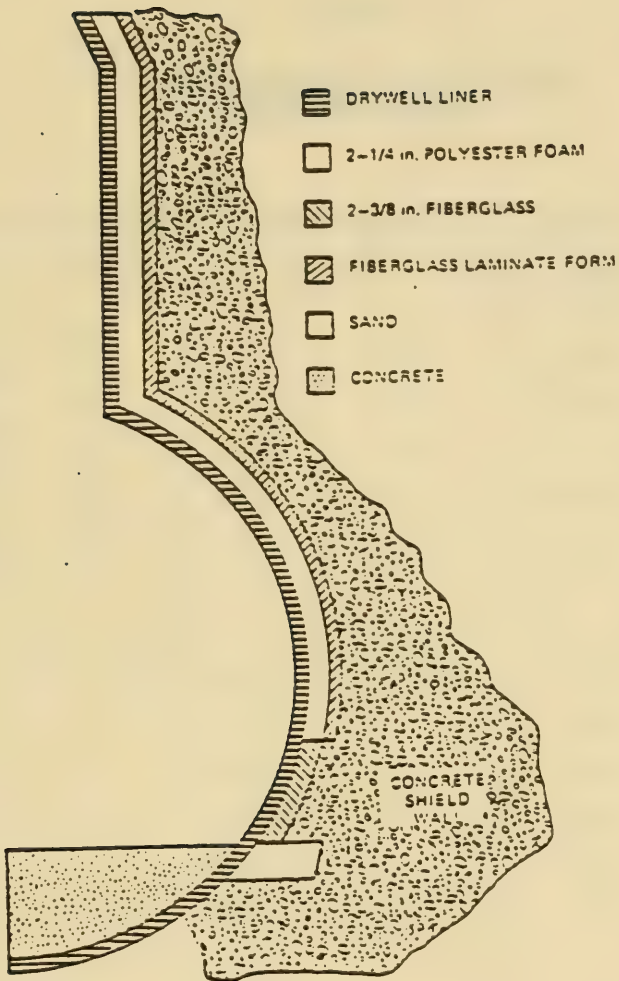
Drywell Liner - Concrete Shield Wall Gap Geometry
